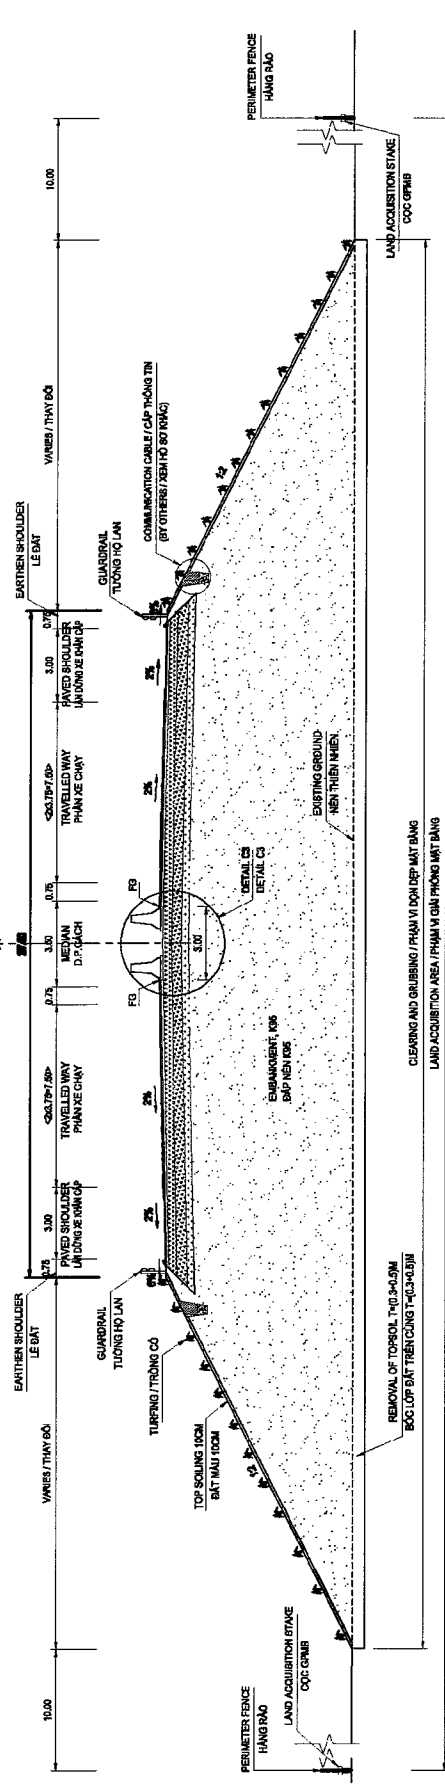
Typical Cross Section of Expressway at Flyover Location
